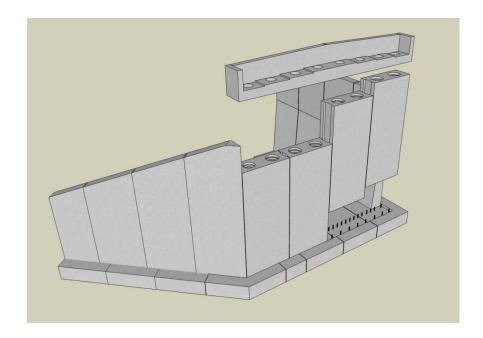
Precast Concrete Cantilever Abutment
